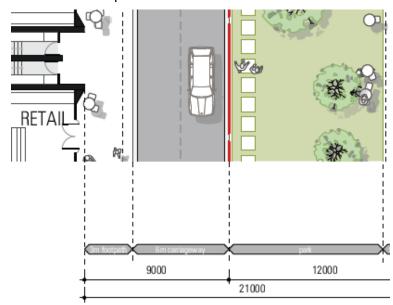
Demonstration of the ability to achieve a 6 metre wide two-way thoroughfare within the 9 metre roadway proposed by the applicant. South-east lot boundary shown in red.
